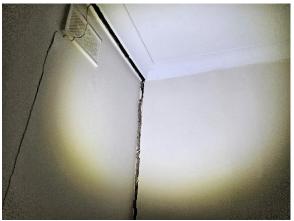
Separation of bed 1's western wall / cornice, and cracking between western elevation and intersecting wall
